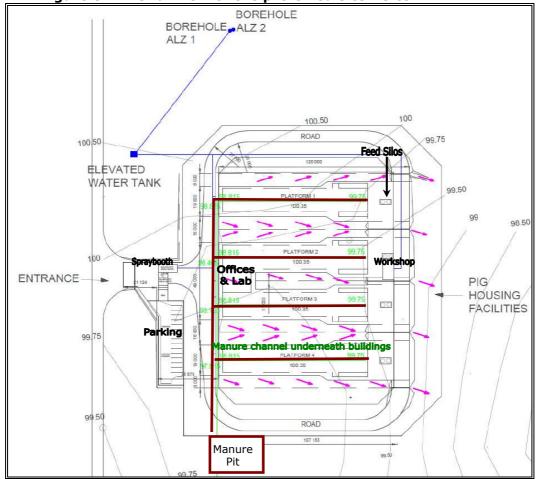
Preferred layout - Layout 6 (adapted from Hlasane, 2018 and Paul Roos, 2017)
